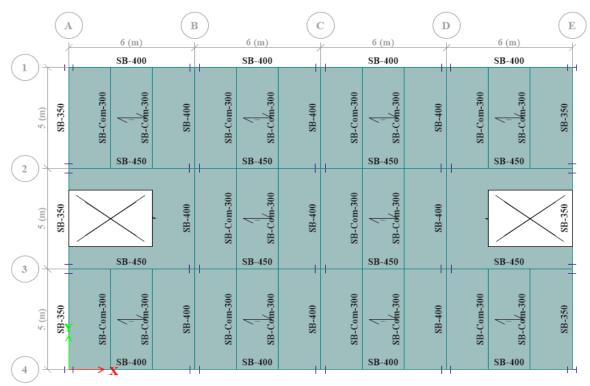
9: 2D Plan Model of Structural Steel Alternative @ 3m
